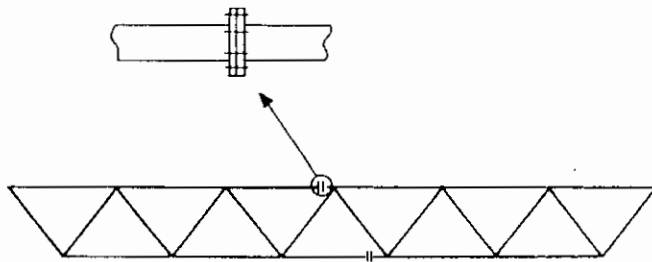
Tubular truss showing bolted flange plate type of splice in chord members.
